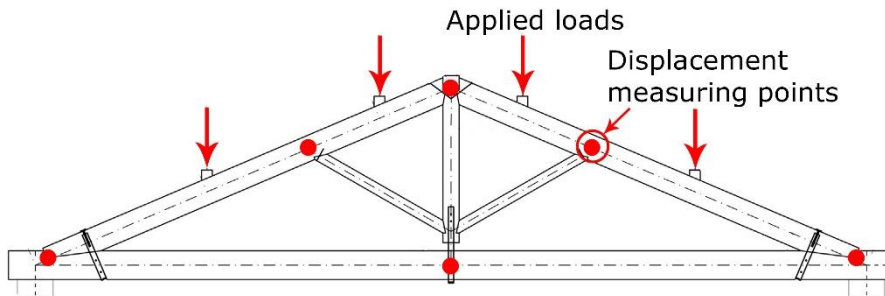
Testing layout of the Chimico Laboratory roof truss (after [12])
